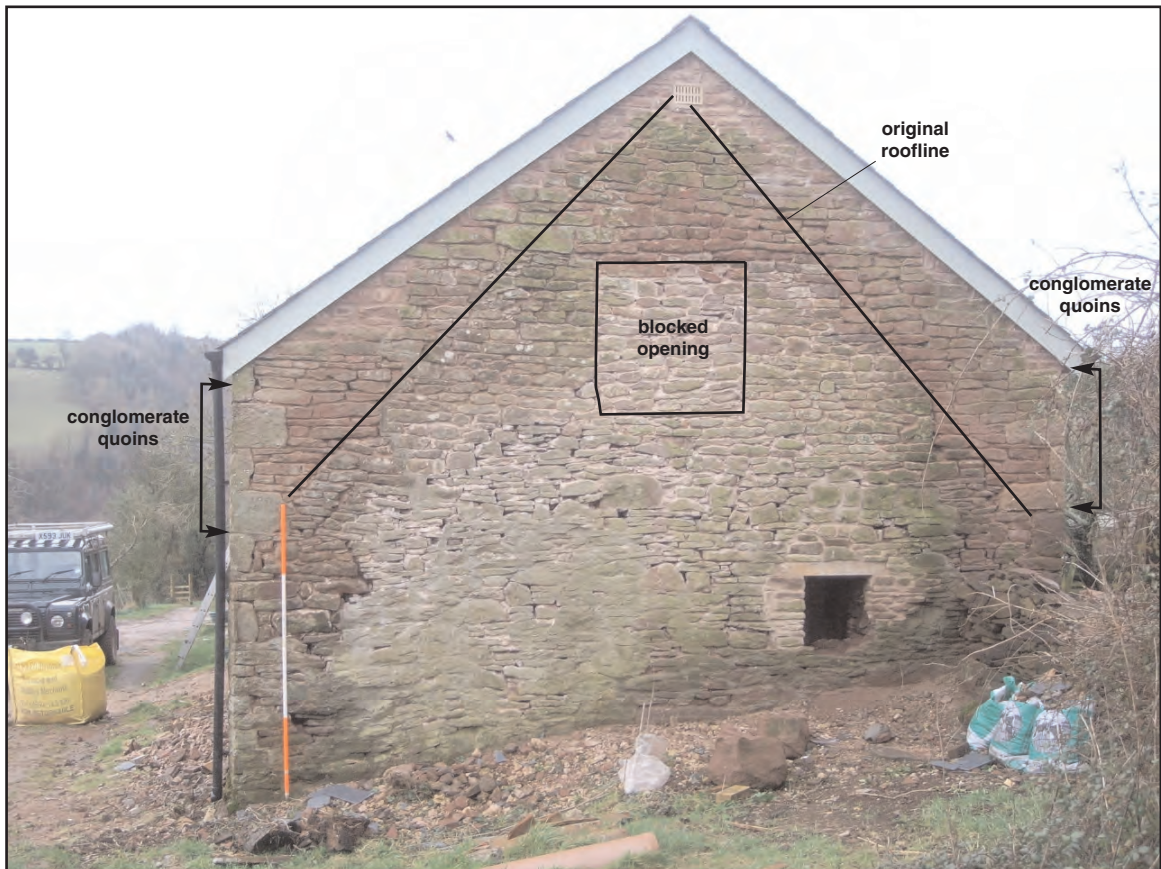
Northern gable of barn showing roofline scar and blocked opening, looking south-west
